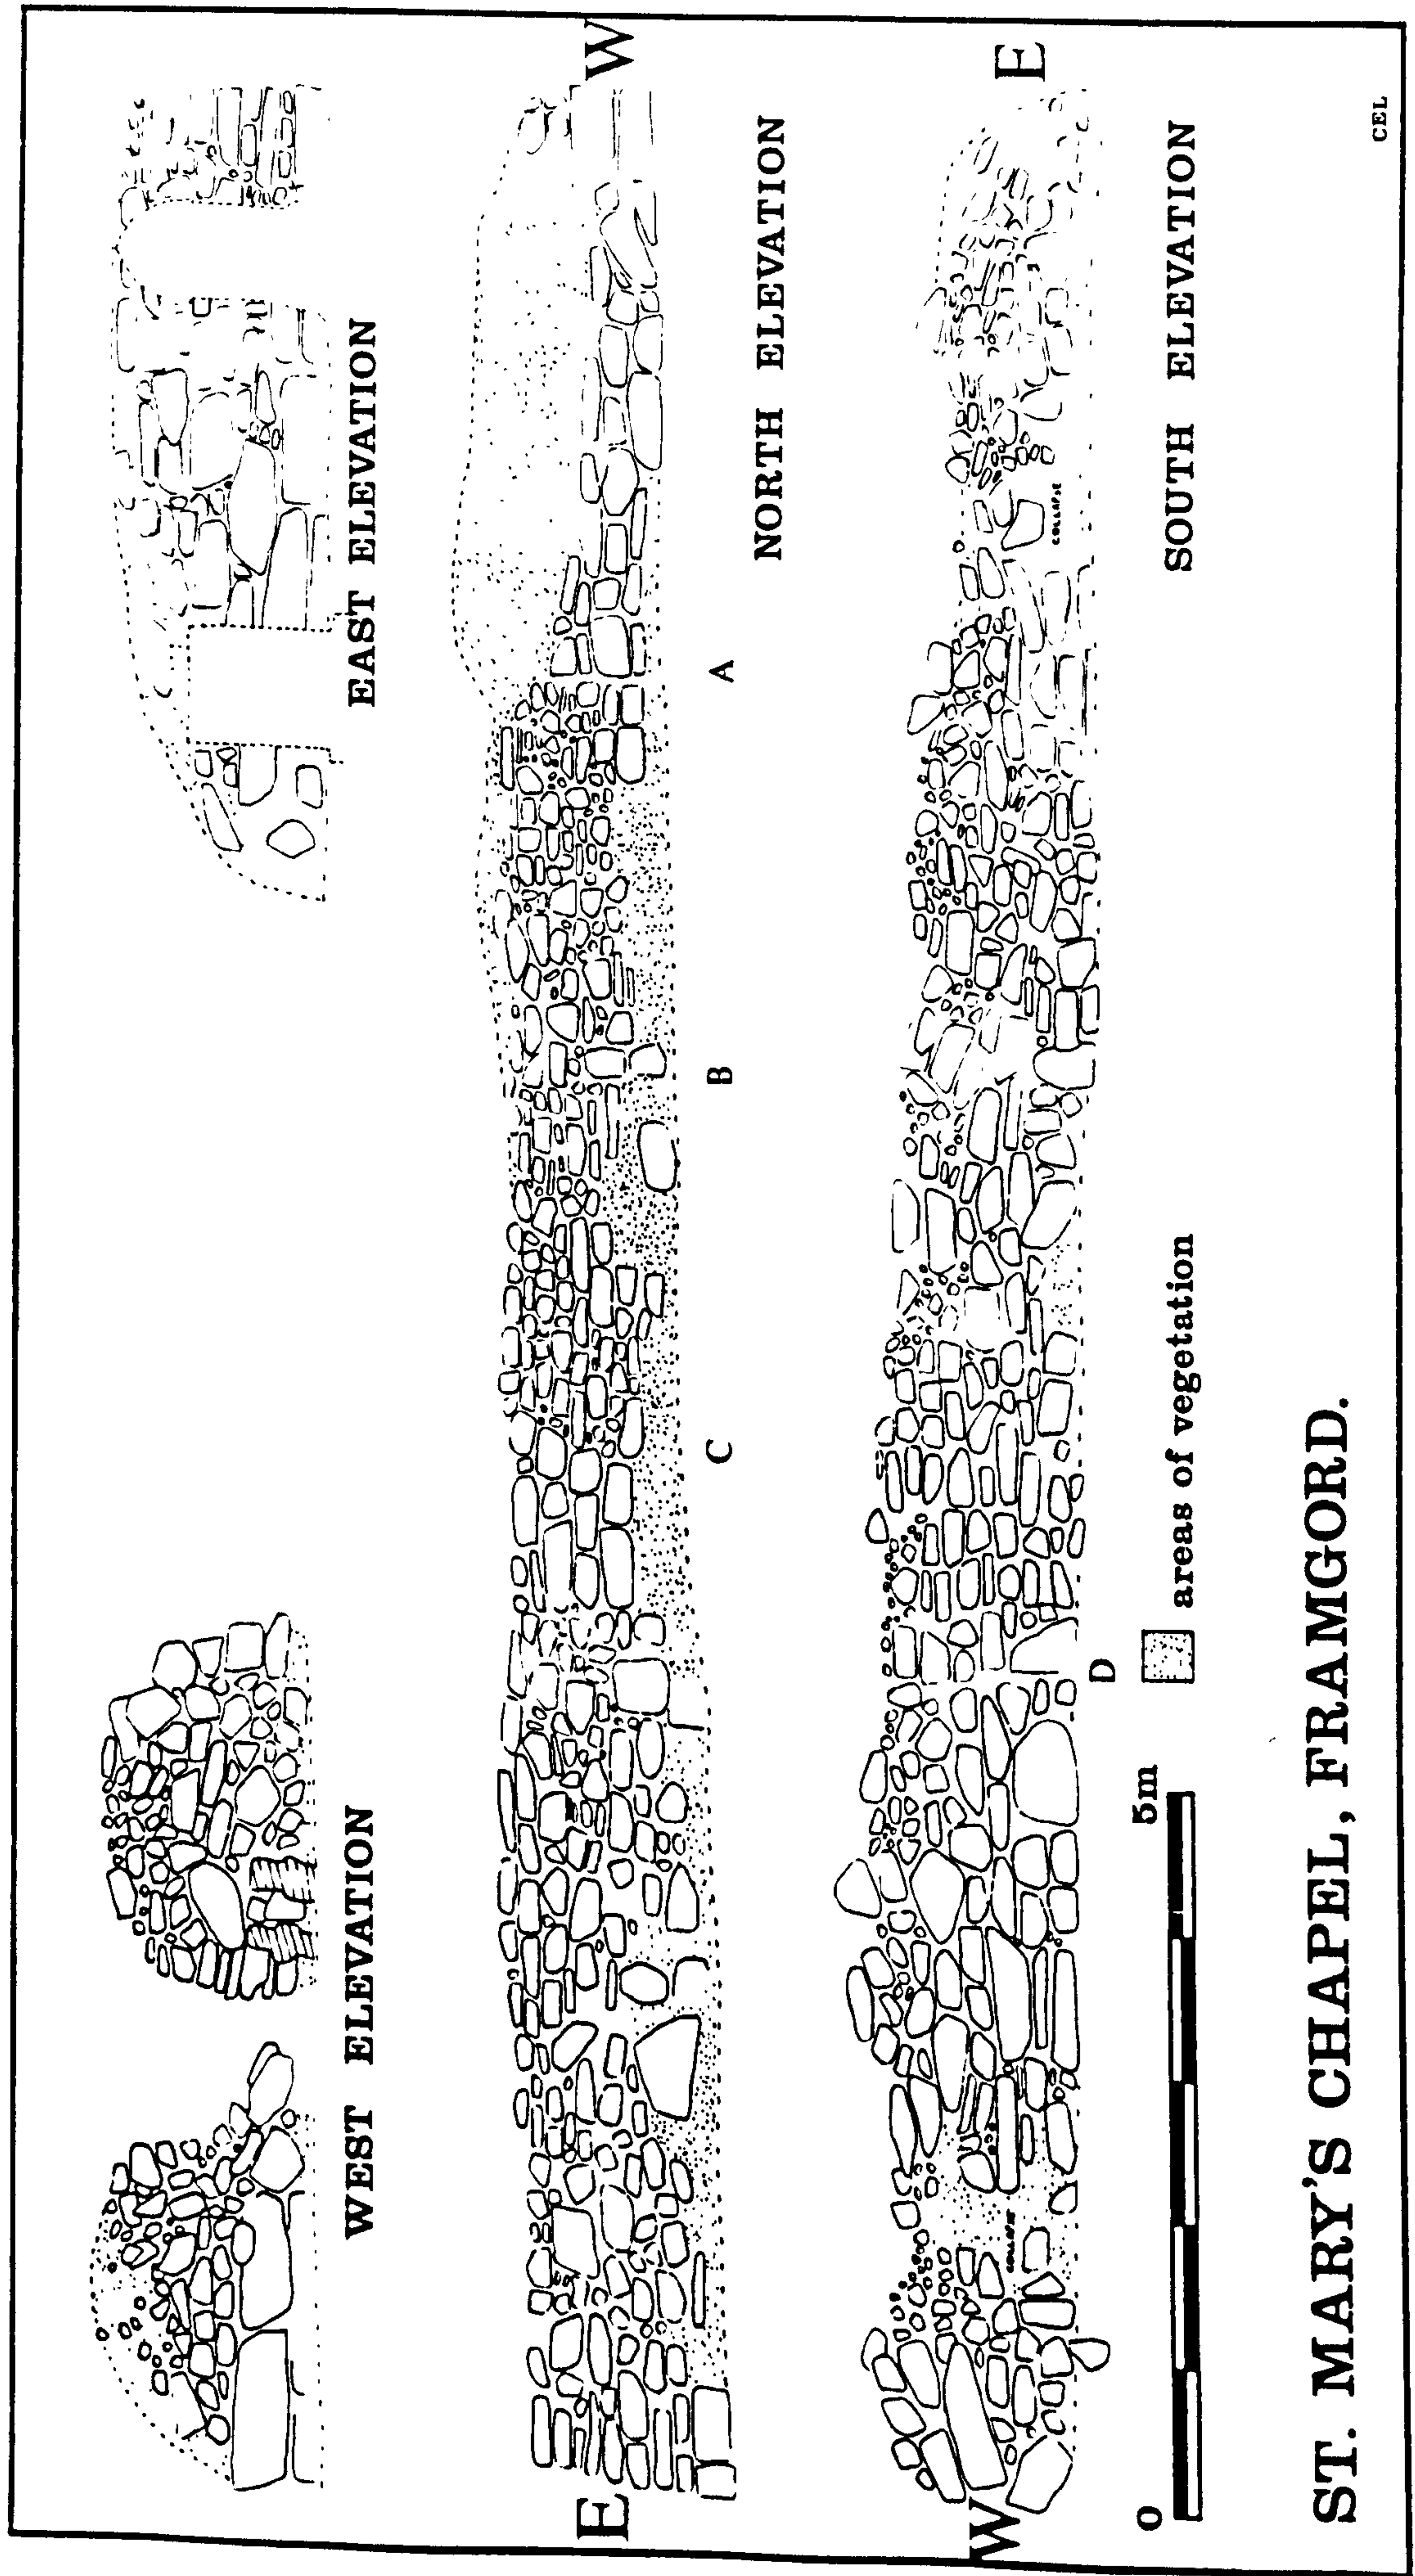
St. Mary's chapel, Framgord (UNST 20): exterior elevations
